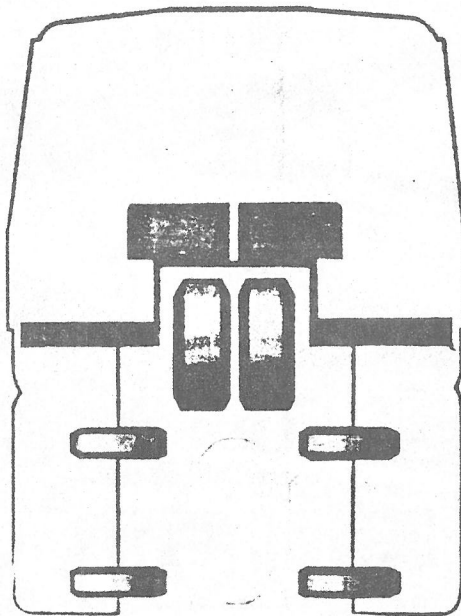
CROSS SECTION OF SUPPORTED MONORAIL SHOWING VERTICAL AND HORIZONTAL TIRES AND HOLLOW CONCRETE BEAM
